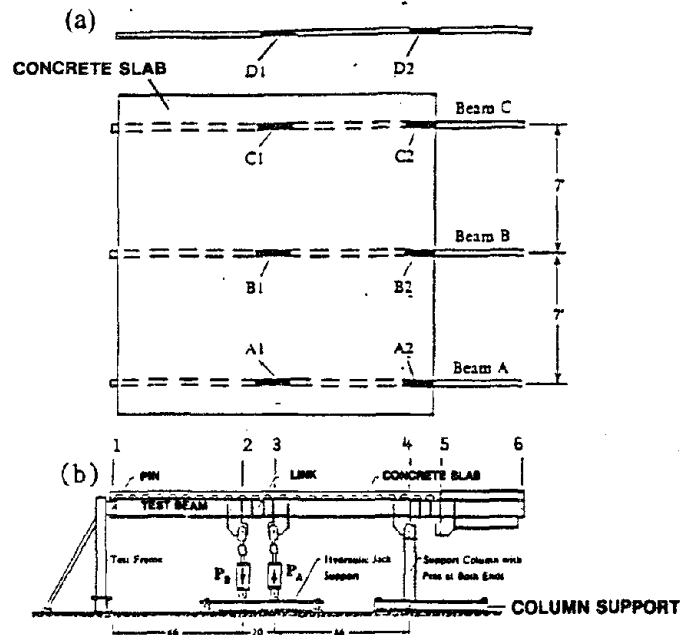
(a)Plan of Specimen Location, and (b)Elevation of K-Braced EBF Subassembly.
